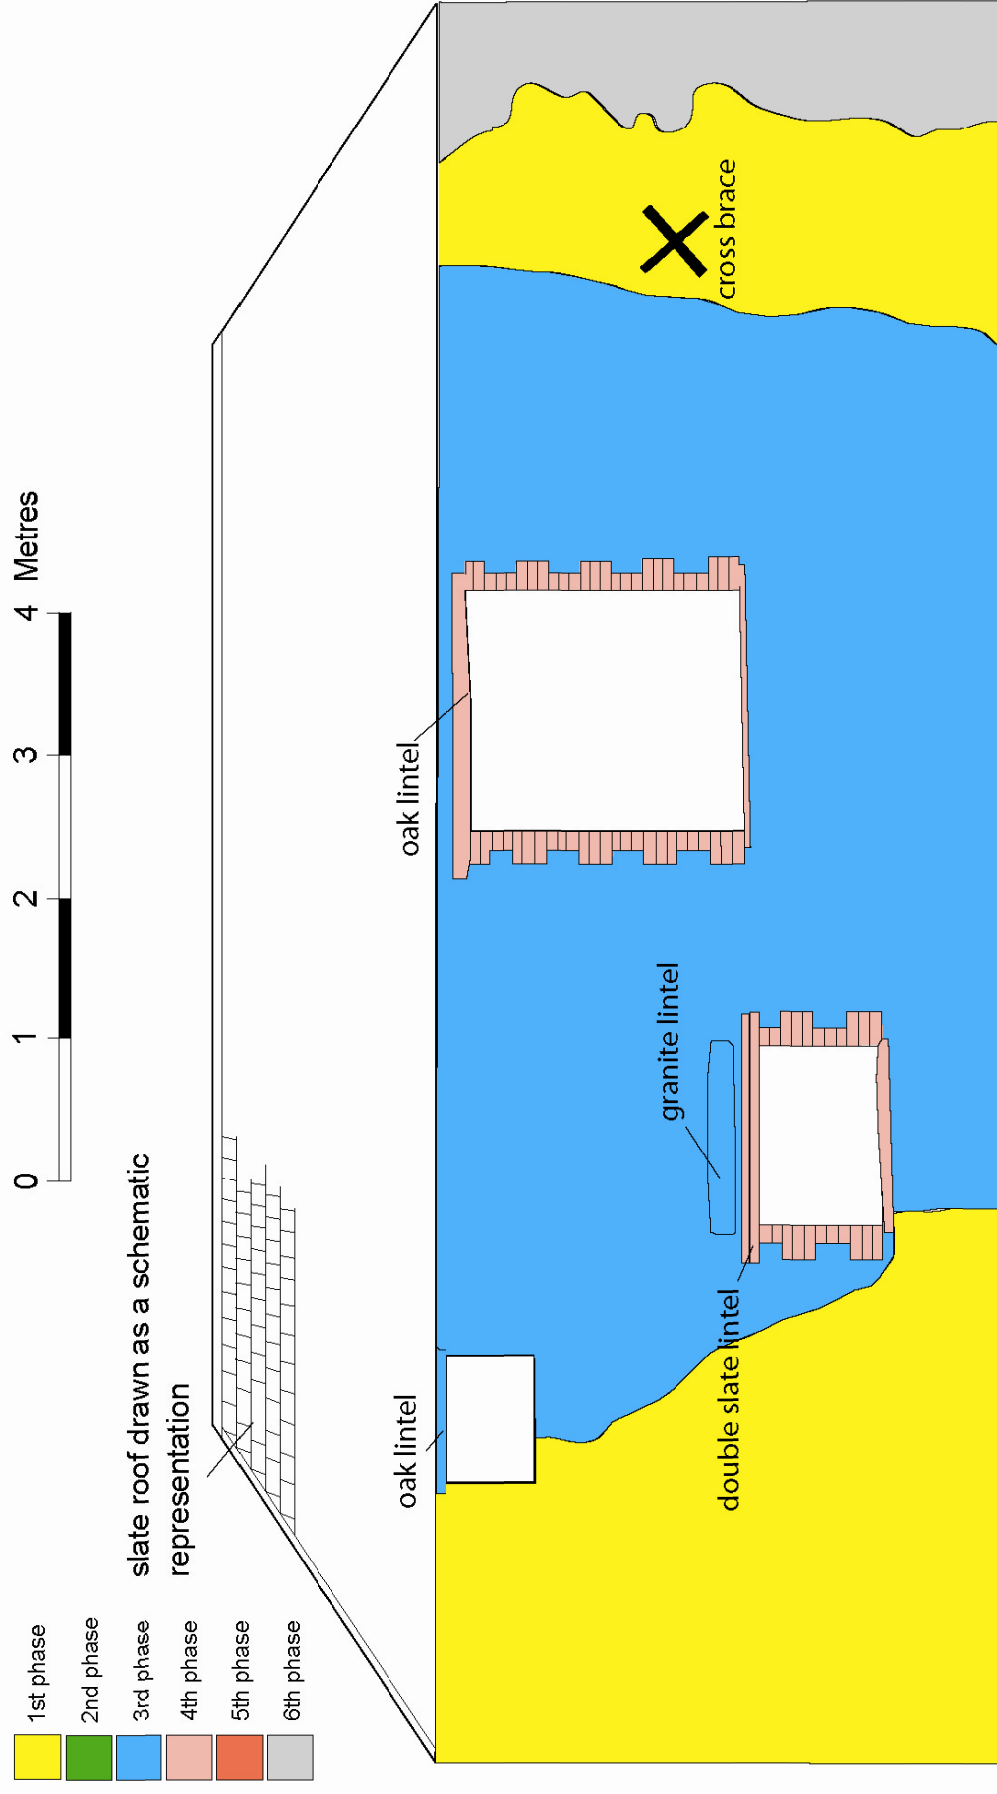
Phased drawing of the south elevation (scale 1:50 @ A4).
